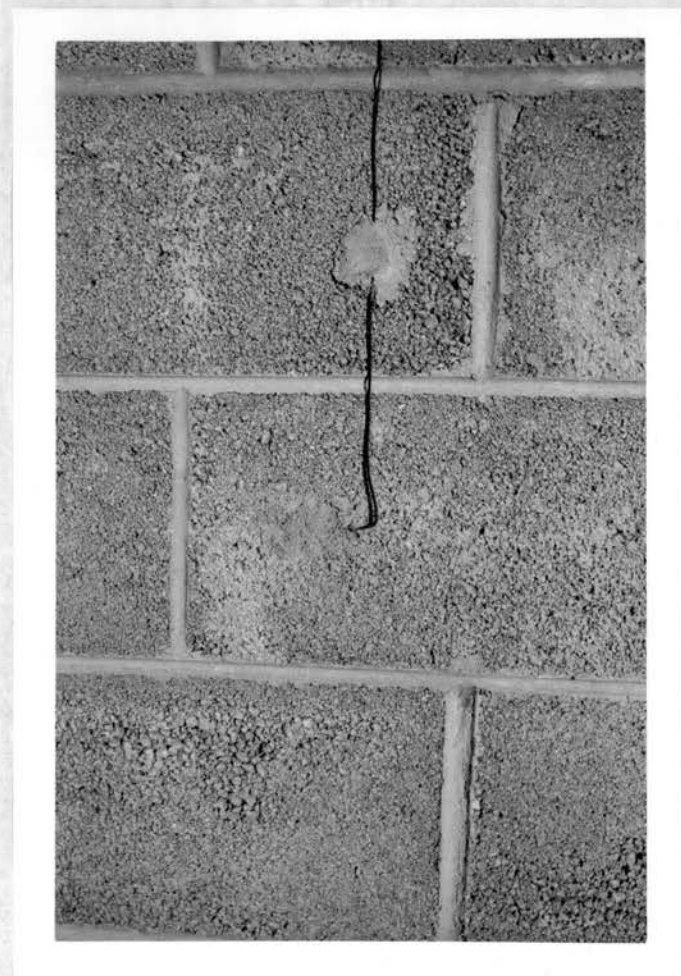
Thermocouple Junction Installation in Surface of Concrete Masonry Wall.
